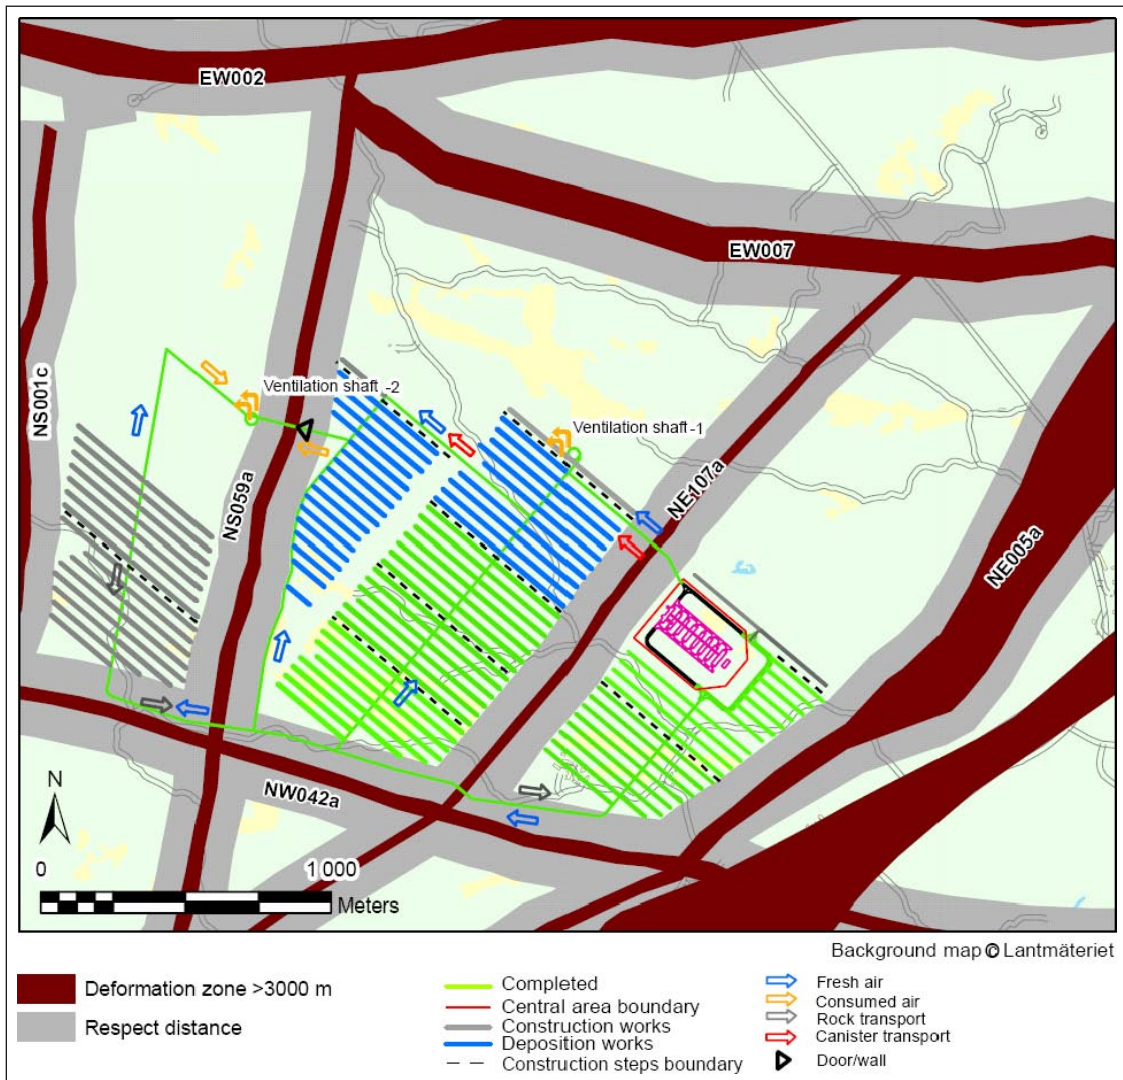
Excavation in construction step 8 and 9 and deposition works in construction step 6 and 7.
